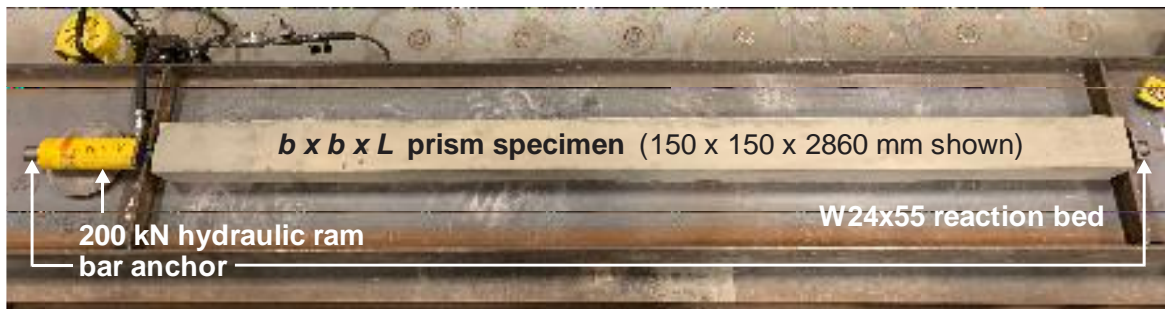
Prism tension test set-up (#6 steel shown).
